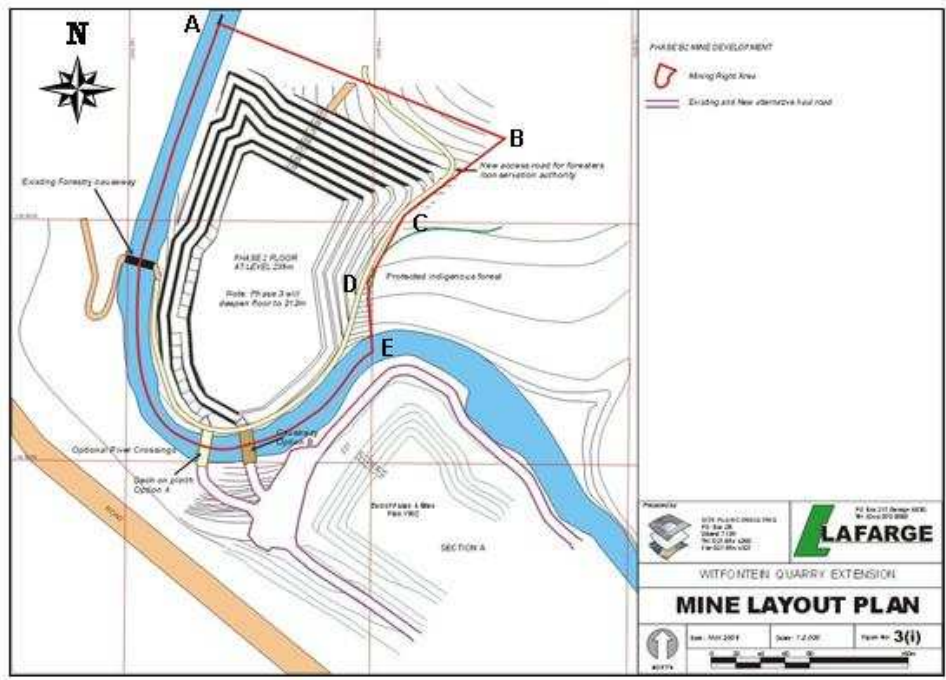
Proposed mine layout plan relative to the existing Witfontein Quarry (courtesy Lafarge SA (Pty) Ltd and Site Plan Consulting). The study area is outlined in red.
